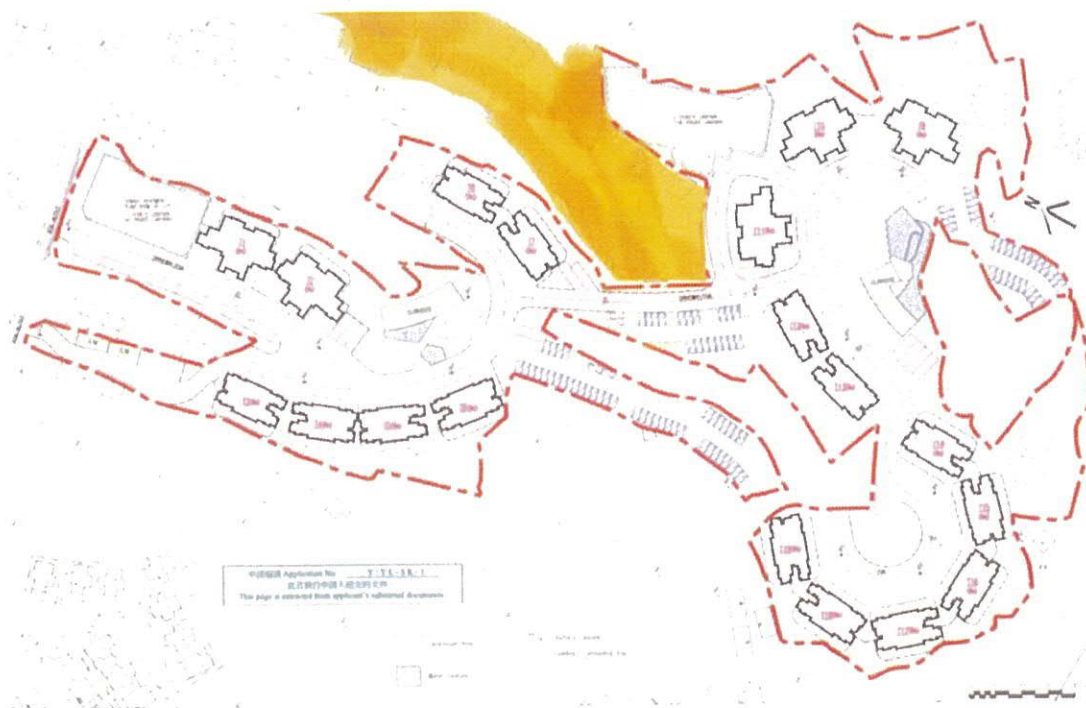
Wah Yuen, as shaded in yellow (Source: Gist Pg 9: Indicative Master Layout Plan)
